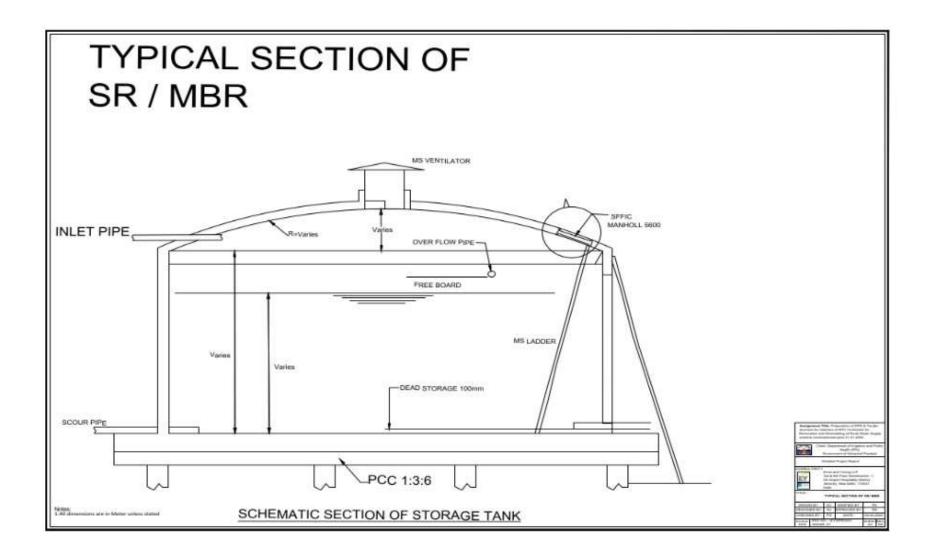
Typical Layout Plan and Schematic Diagram of Various Components
